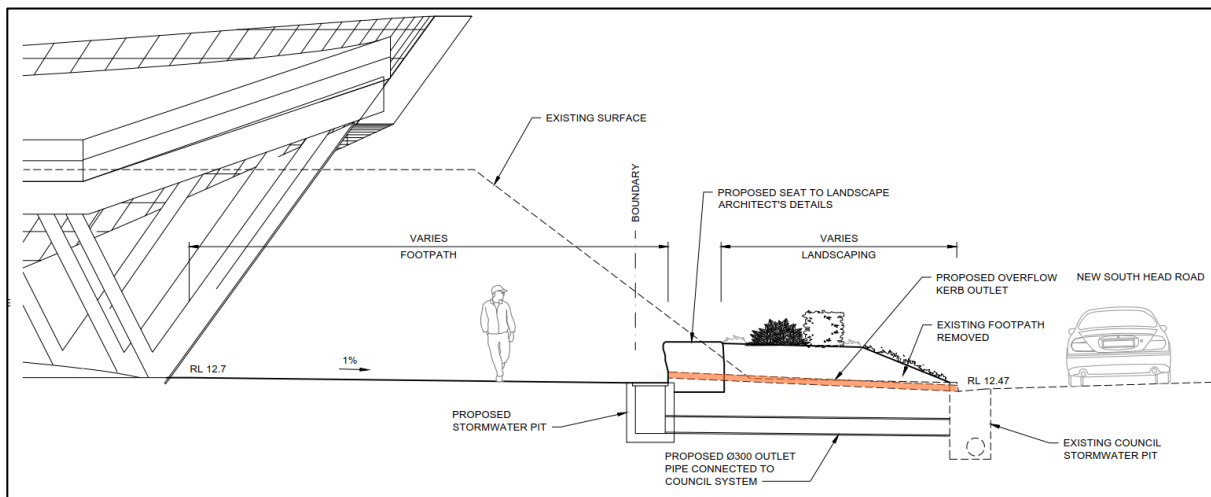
Typical section through AFC frontage to New South Head Road (section A-A)
